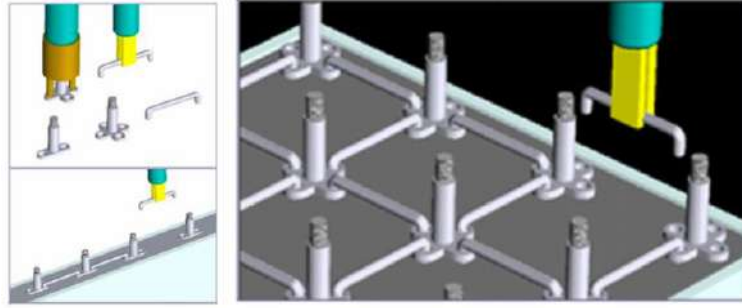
Assembling steel elements inside a shell printed by a 3D printer and subsequent burying of the steel elements by pouring in concrete into the shell developed by Khoshnevis [5]
